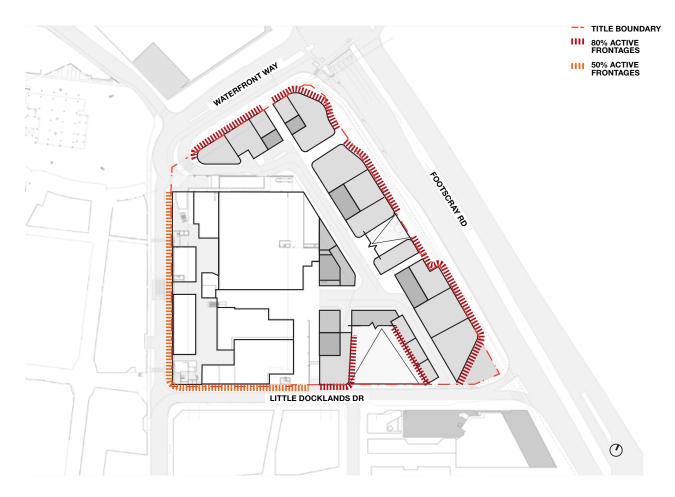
Concept Plan 4 - Ground Floor Public Realm Activation
